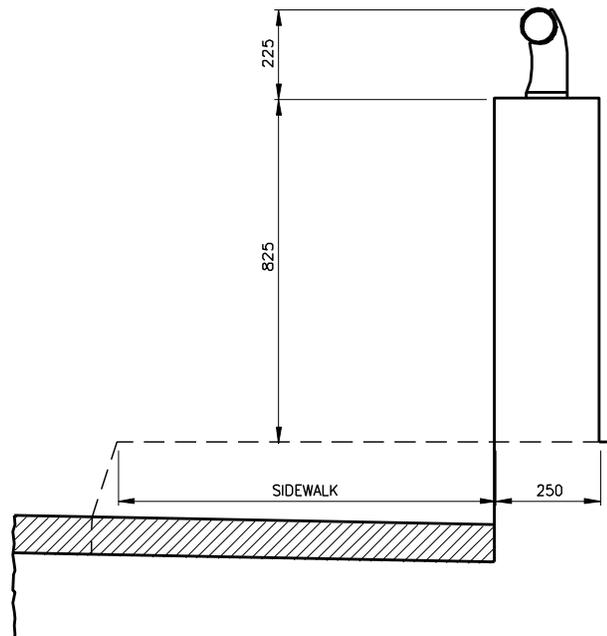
Parapet Wall with Railing (TL-4)
